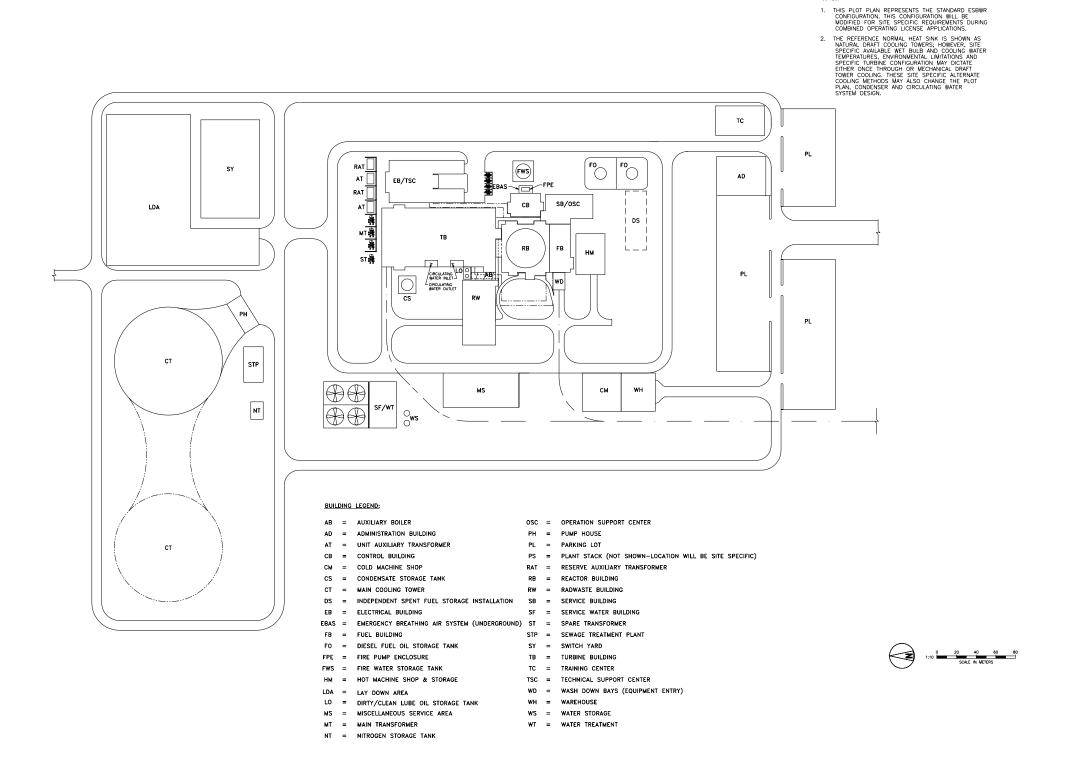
ESBWR Standard Plant General Site Plan
